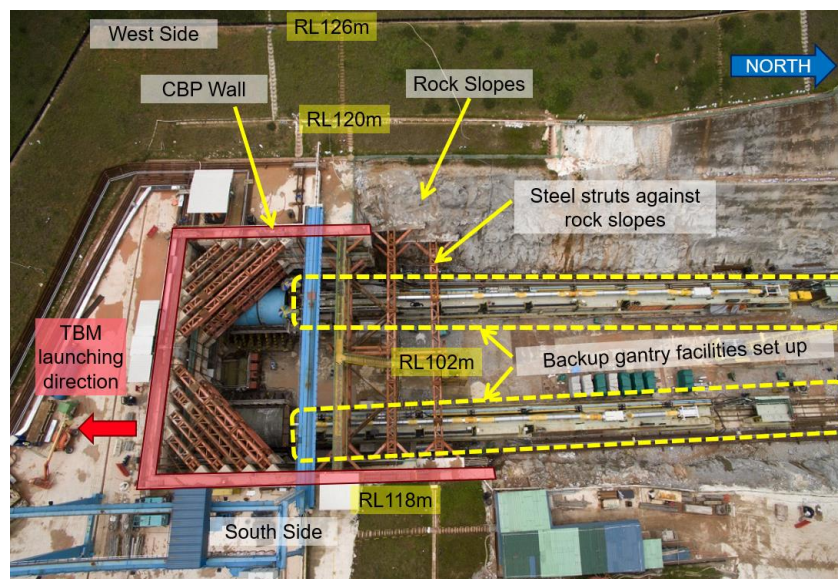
Aerial View of the Launch Shaft – some steel struts were struttged against the rock slopes
